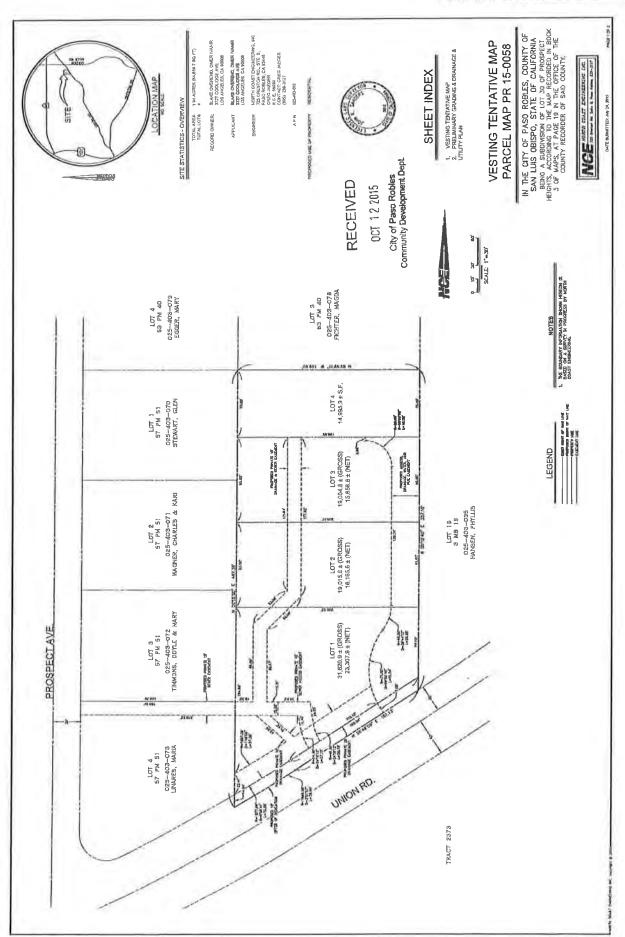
(Tri-West Development) 2025 Union Road
